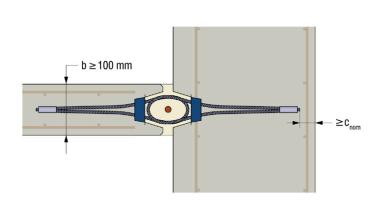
Wall – Wall – T-CONNECTION - standard detail
